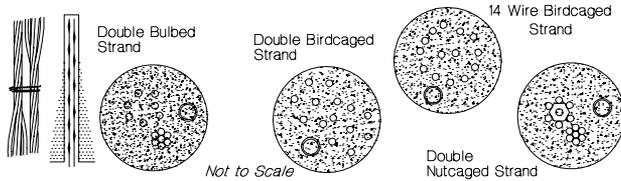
Modified geometry double or twin strand cablebolt configurations currently in use in underground and open pit mines
